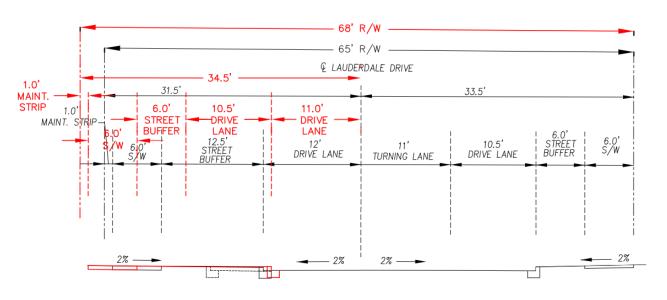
Preliminary Plan and Site Plan Amendment Proposal
